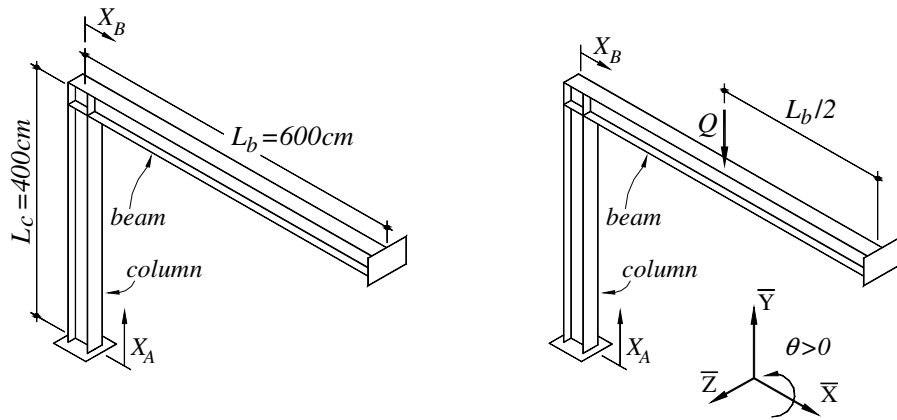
"L-shaped" frame formed by I-section members (LF-I): geometry, loading and support conditions.
